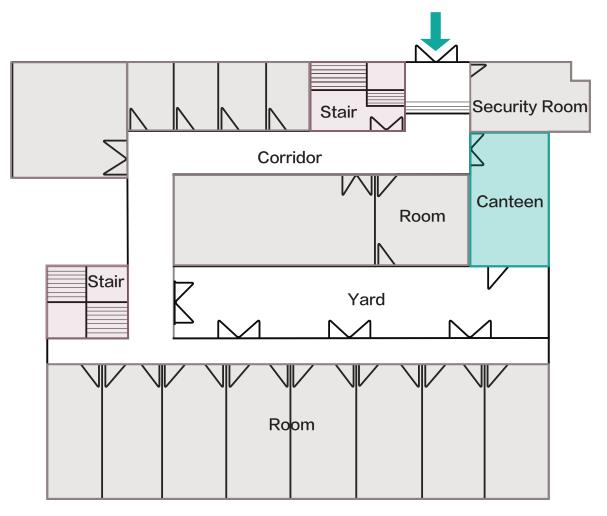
1F\_floor plan of the Si Ping Jing Lao Yuan
